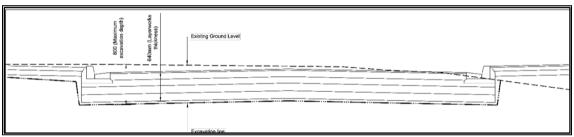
Excavation for road layerworks at depth (source: Walters, 2020)
